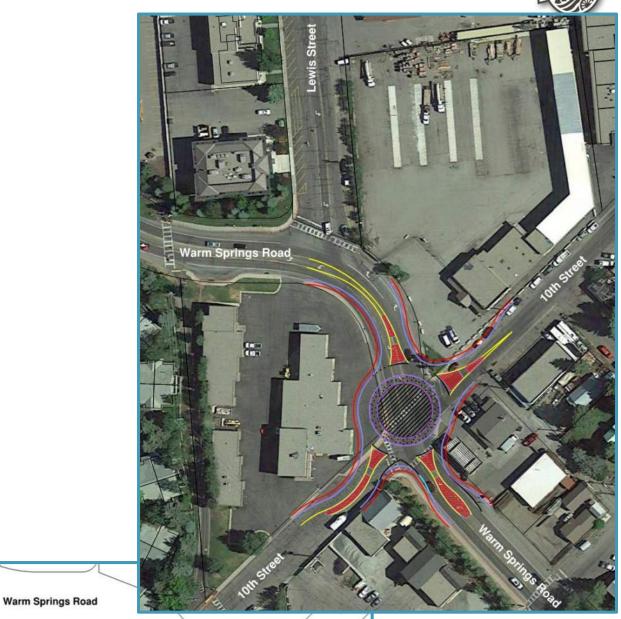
Warm Springs Road and 10th Street Single Lane Roundabout Concept
